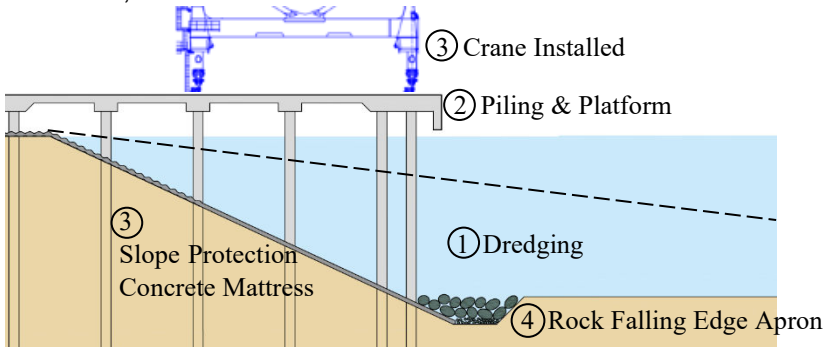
Traditional Marine Construction with Concrete Mattress Installed Below the Deck
